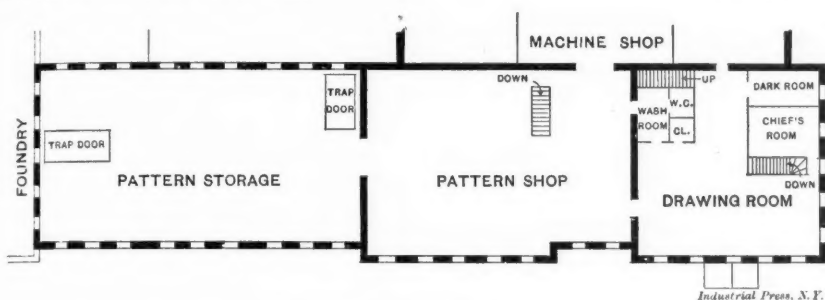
Plan of Second Floor in Foundry. Scale, one inch equals forty-eight feet.
